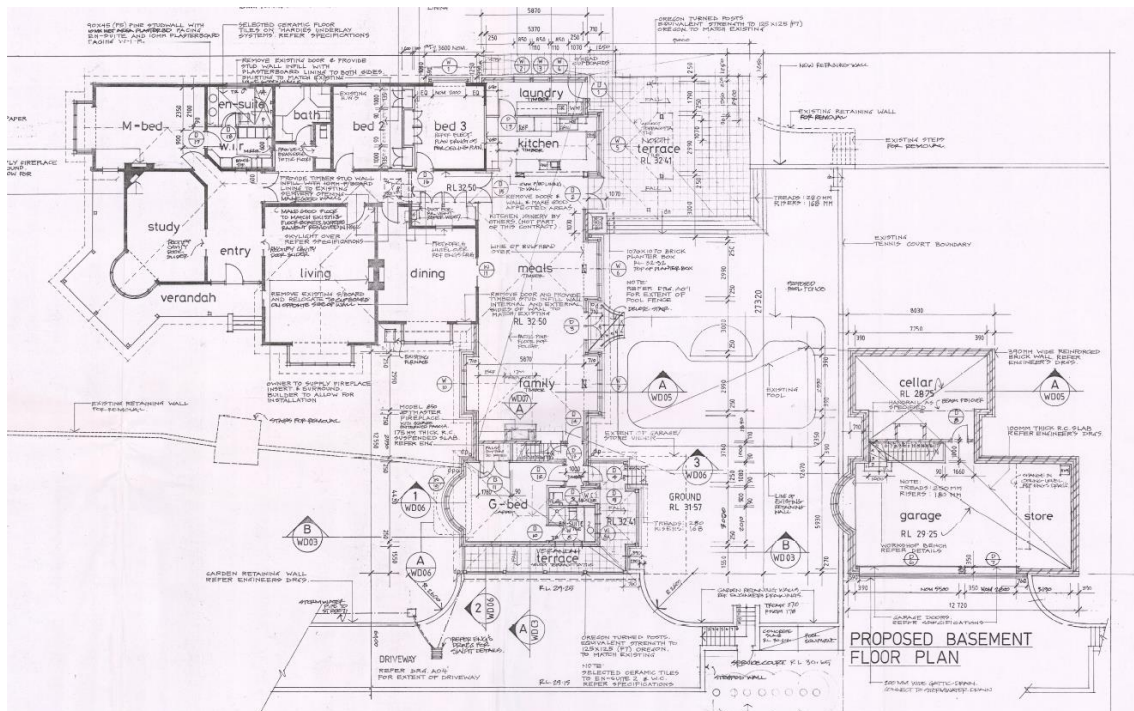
Detail of the floor plan showing the extent of the rear and south wing addition
